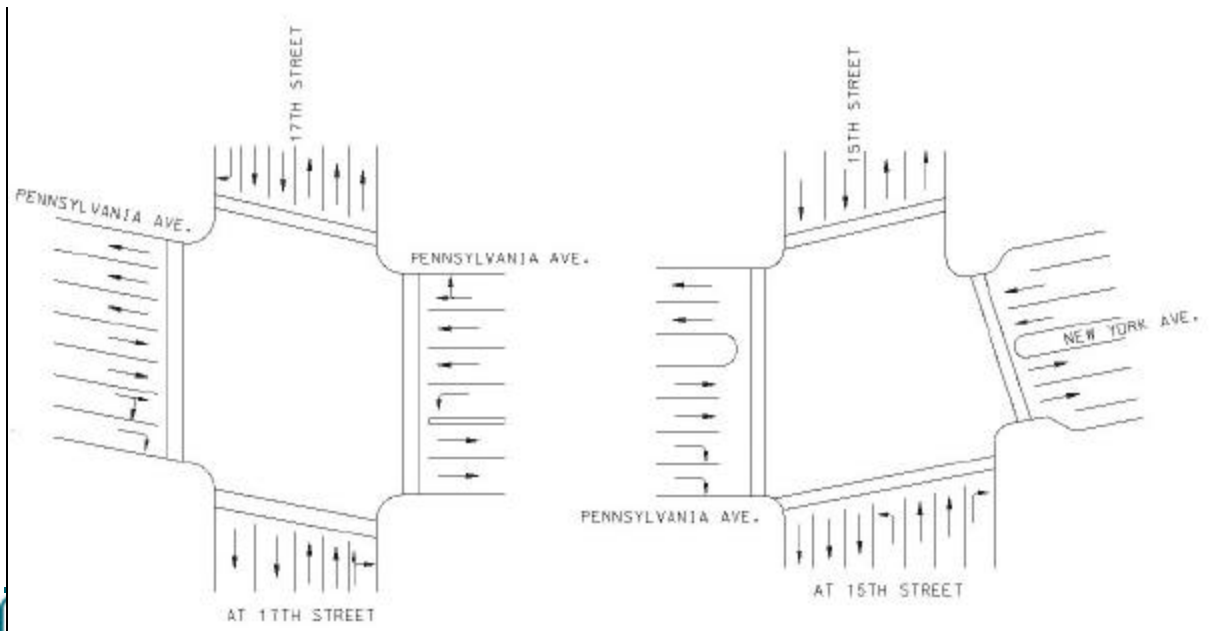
Preliminary Intersection Plans of Pennsylvania Avenue at 15th and 17th Streets
